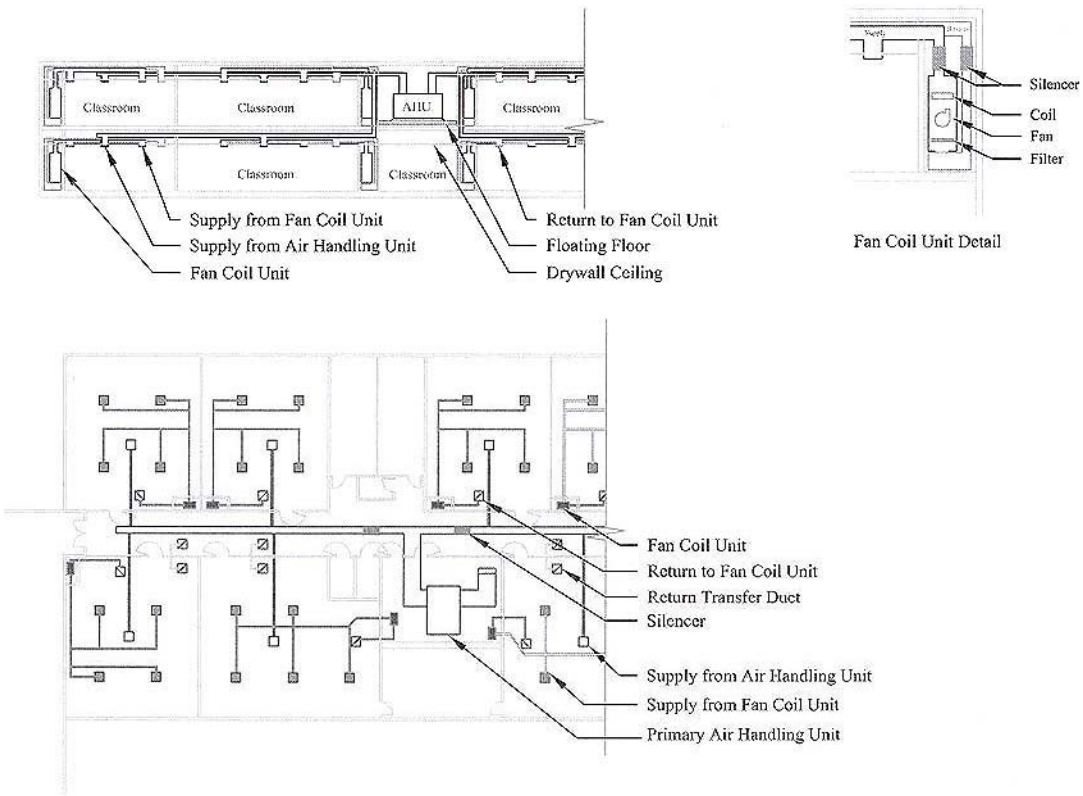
Conceptual section sketch, detail and floor plan of Case Study 4: Primary Air AHU Plus Fan Coil Units in Closets
